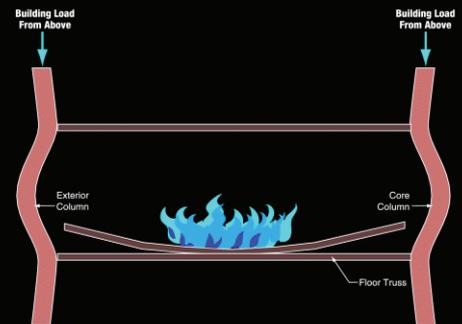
Buckling of columns initiated by failure of floor framing and connections.
